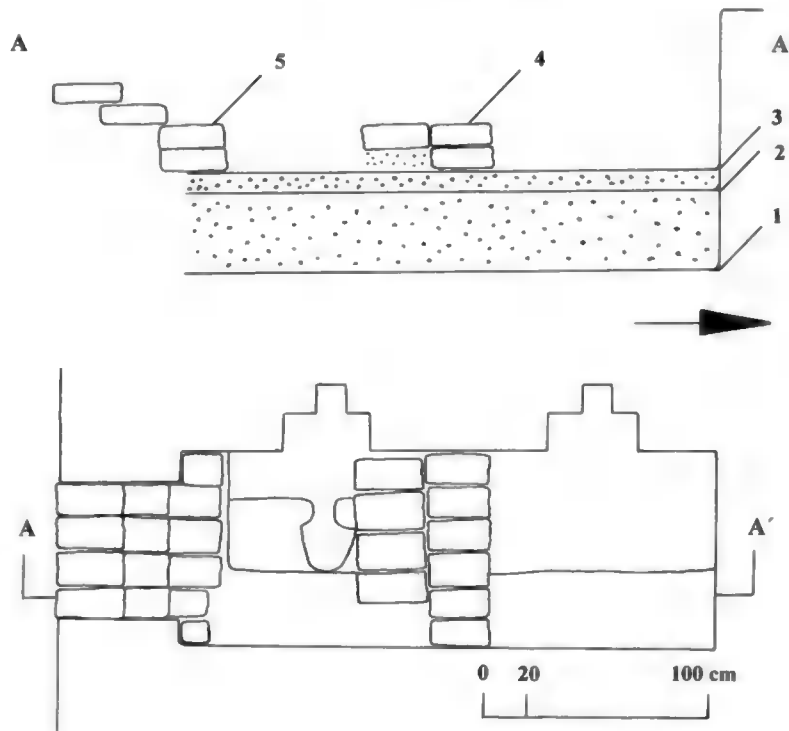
Section and ground plan of the chapel in Tomb 3 (1 – the original floor of the chapel, 2 – second floor on a layer of clean sand, 3 – third chapel floor on a layer of clean sand, 4 – partition mudbrick wall built on the third floor level and closing off the north part of the chapel, 5 – mudbrick steps leading into the chapel with the third floor)
